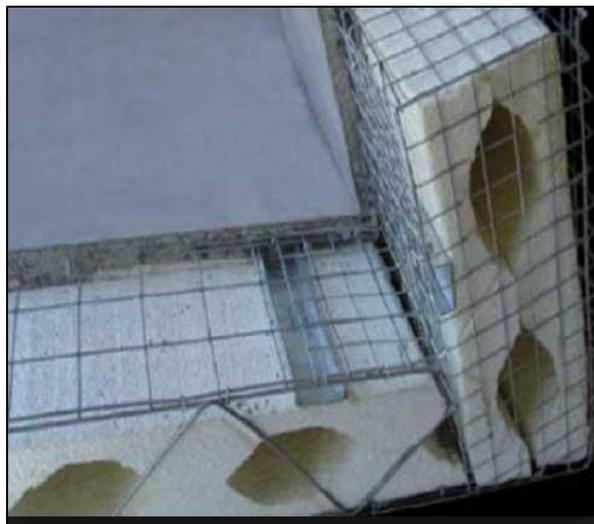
Close up view on the core wall system (Structural concrete insulated panels)
